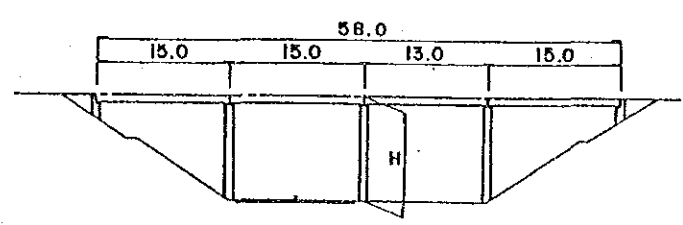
Typical Cross Sections on Staged Construction
